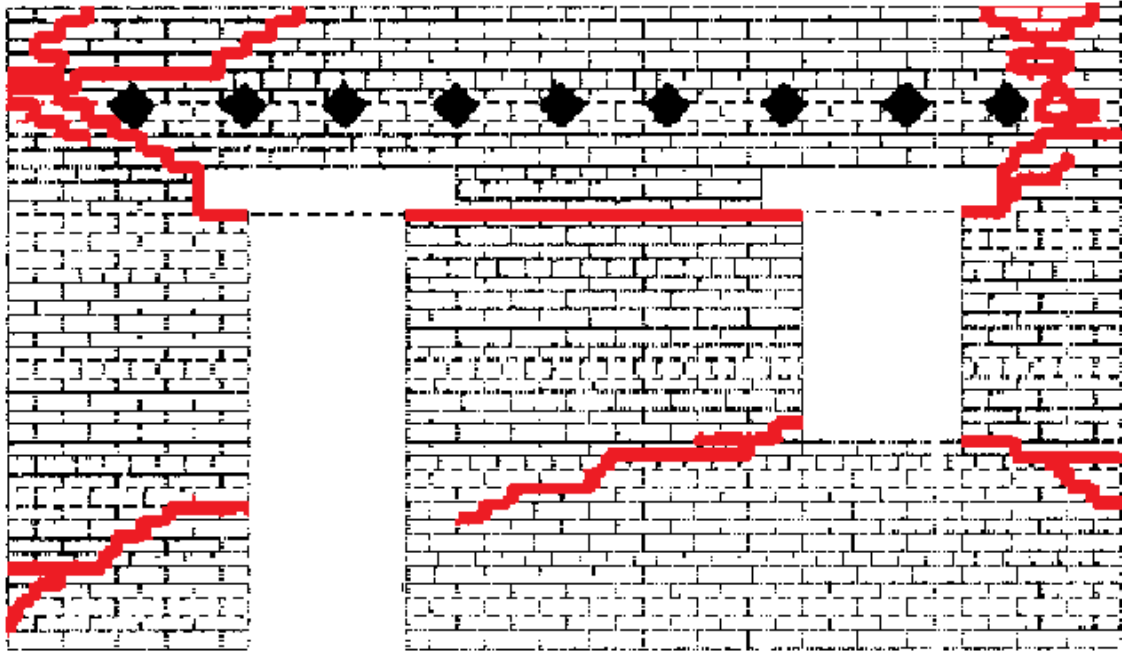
Experimentally observed cracks on east wall (adapted from Paquette and Bruneau, 2003)
